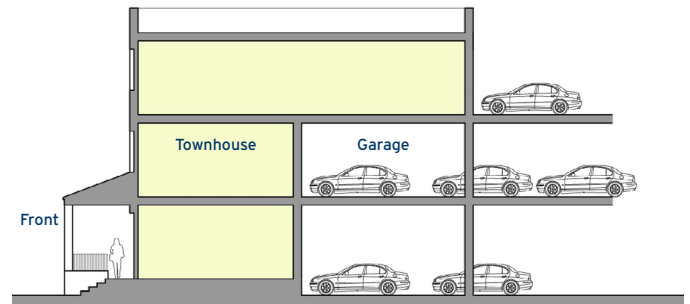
Section of a Townhouse Wrapping the Podium of Garage
